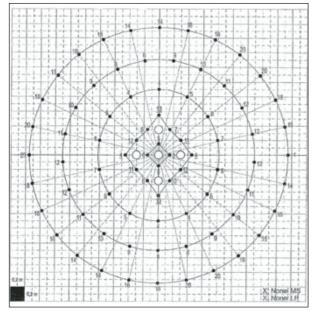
Ignition plan for a Ø3.5 m underwater tunnel piercing blast. (Illustration: AFS)
